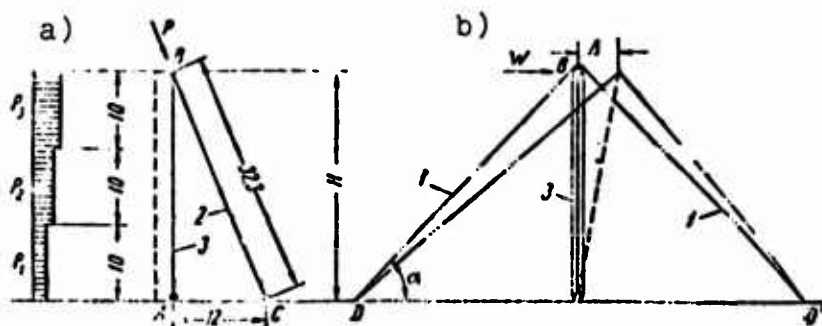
The diagram of a flat-mounted metallic ferroconcrete or wooden pile driver, the stability of which is provided crosswise for the stretching cables: a) diagram of the frame of the pile driver in the plane of lift; b) diagram of the structure in the plane, perpendicular to the plane of lift; 1 - stretching cables; 2 - boom; 3 - mount.
